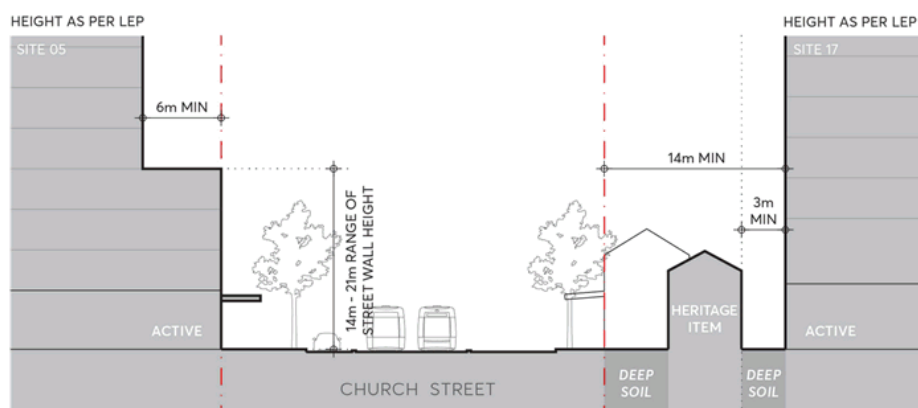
Site 17 (Section JI) Setbacks and Street Wall Height
